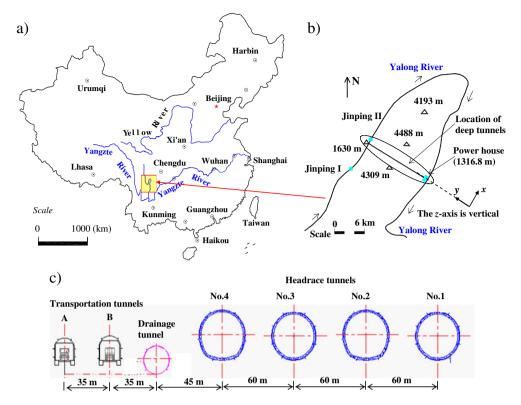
Location and plan of the Jinping II hydropower station: (a) Location of the Jinping project in China, (b) Layoutof the Jinping hydropower project across the Yalong River, (c) Configuration of seven tunnels.
